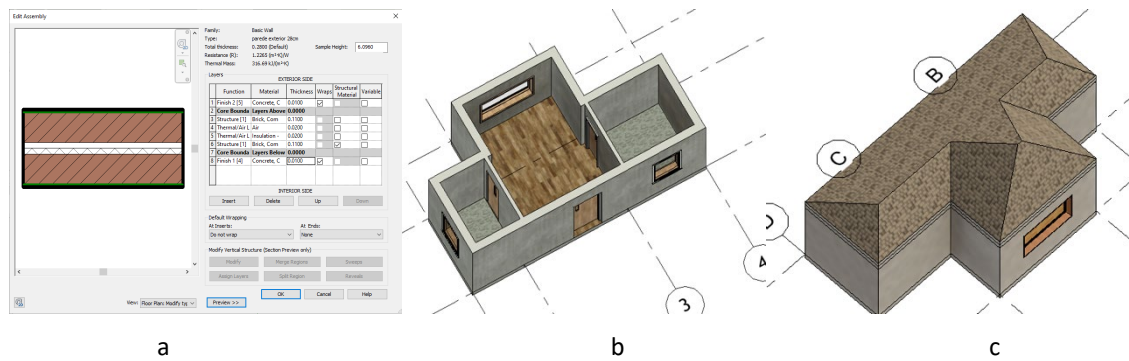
Didactic example of a small house: parametric object (a), architectural walls (b) and roof (c).
